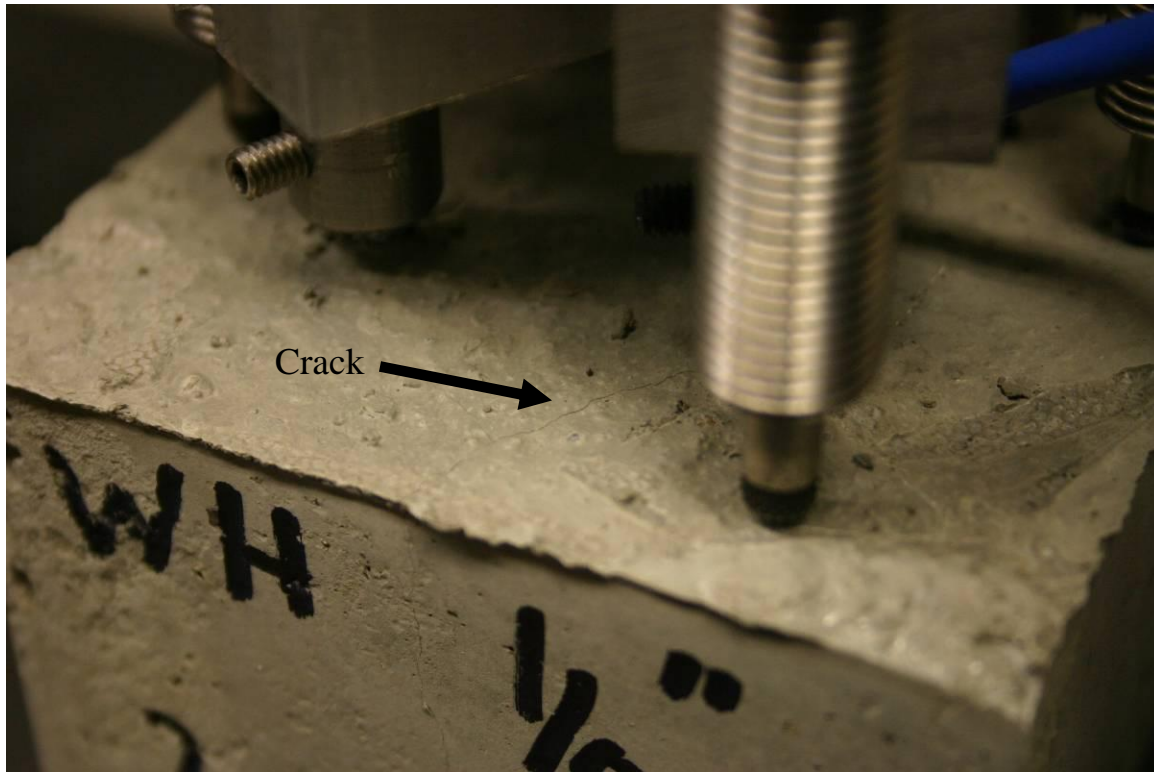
Cracking of specimen with three 3/32-inch diameter rods located on the wire
